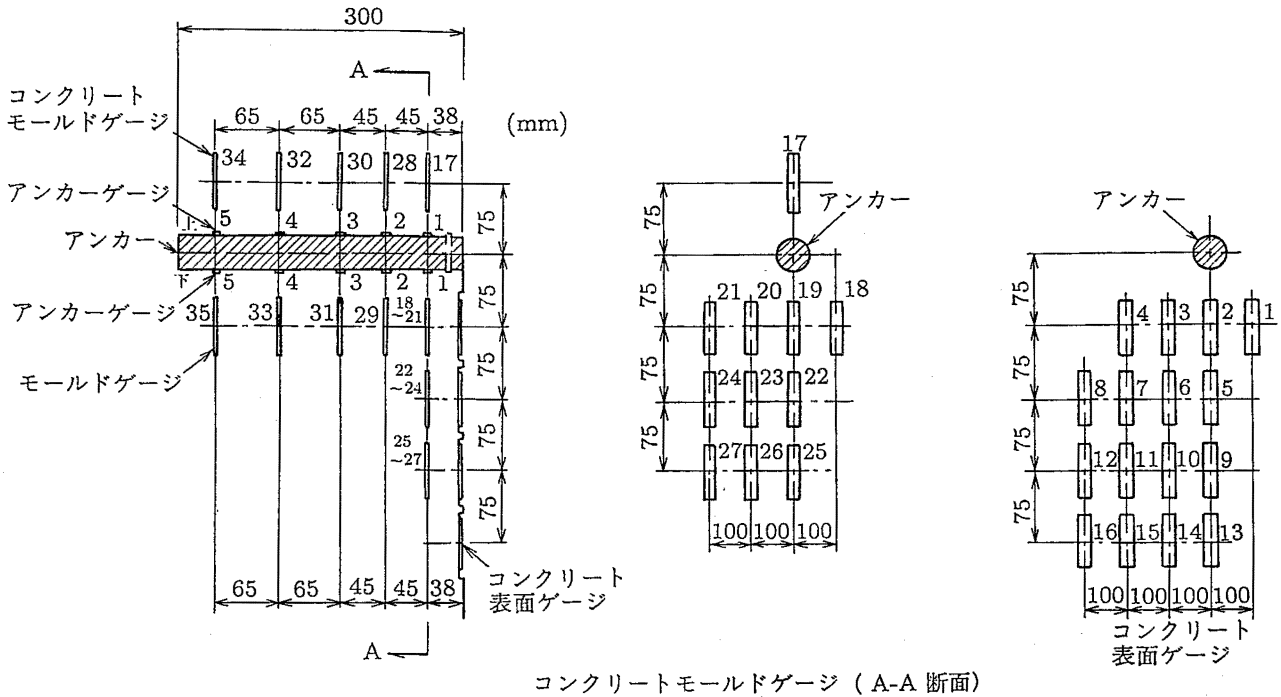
Arrangement of wire strain gauges in anchor and concrete
